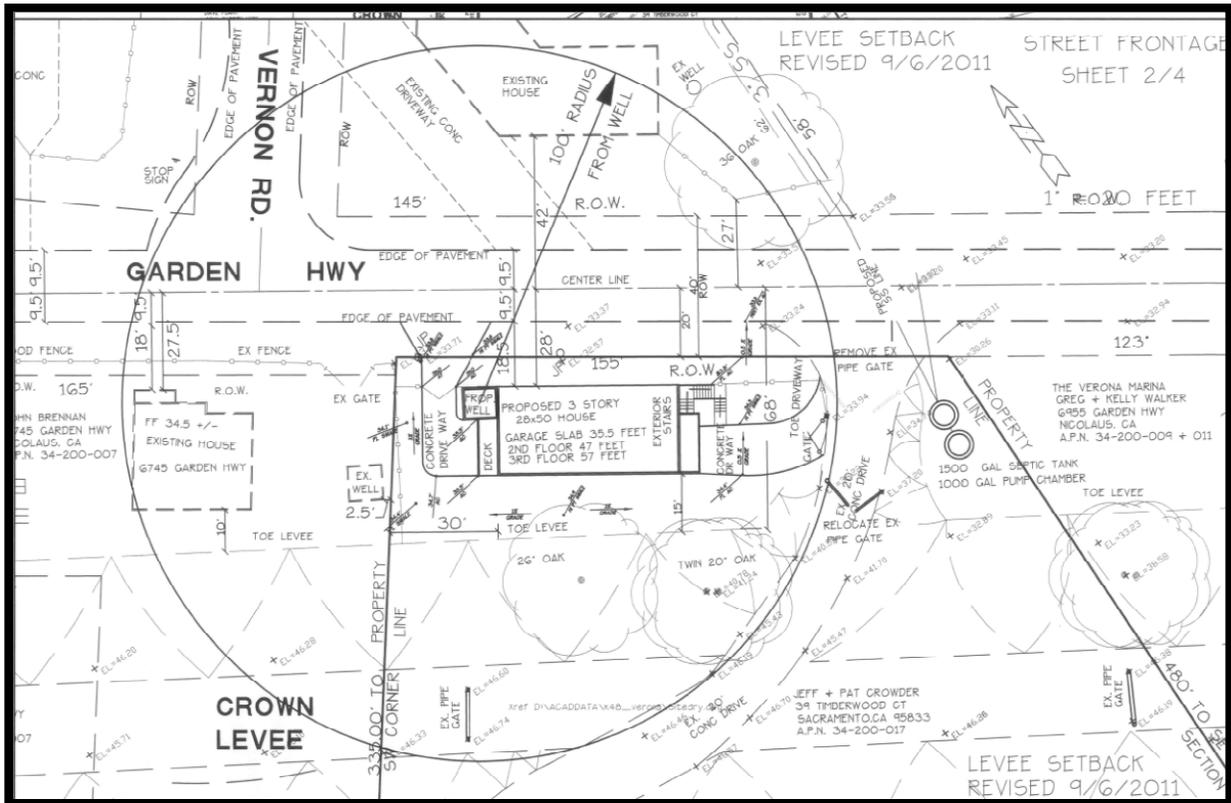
Application 18712 Site Plan (Source: Submitted by Applicant on 9/6/2011)
